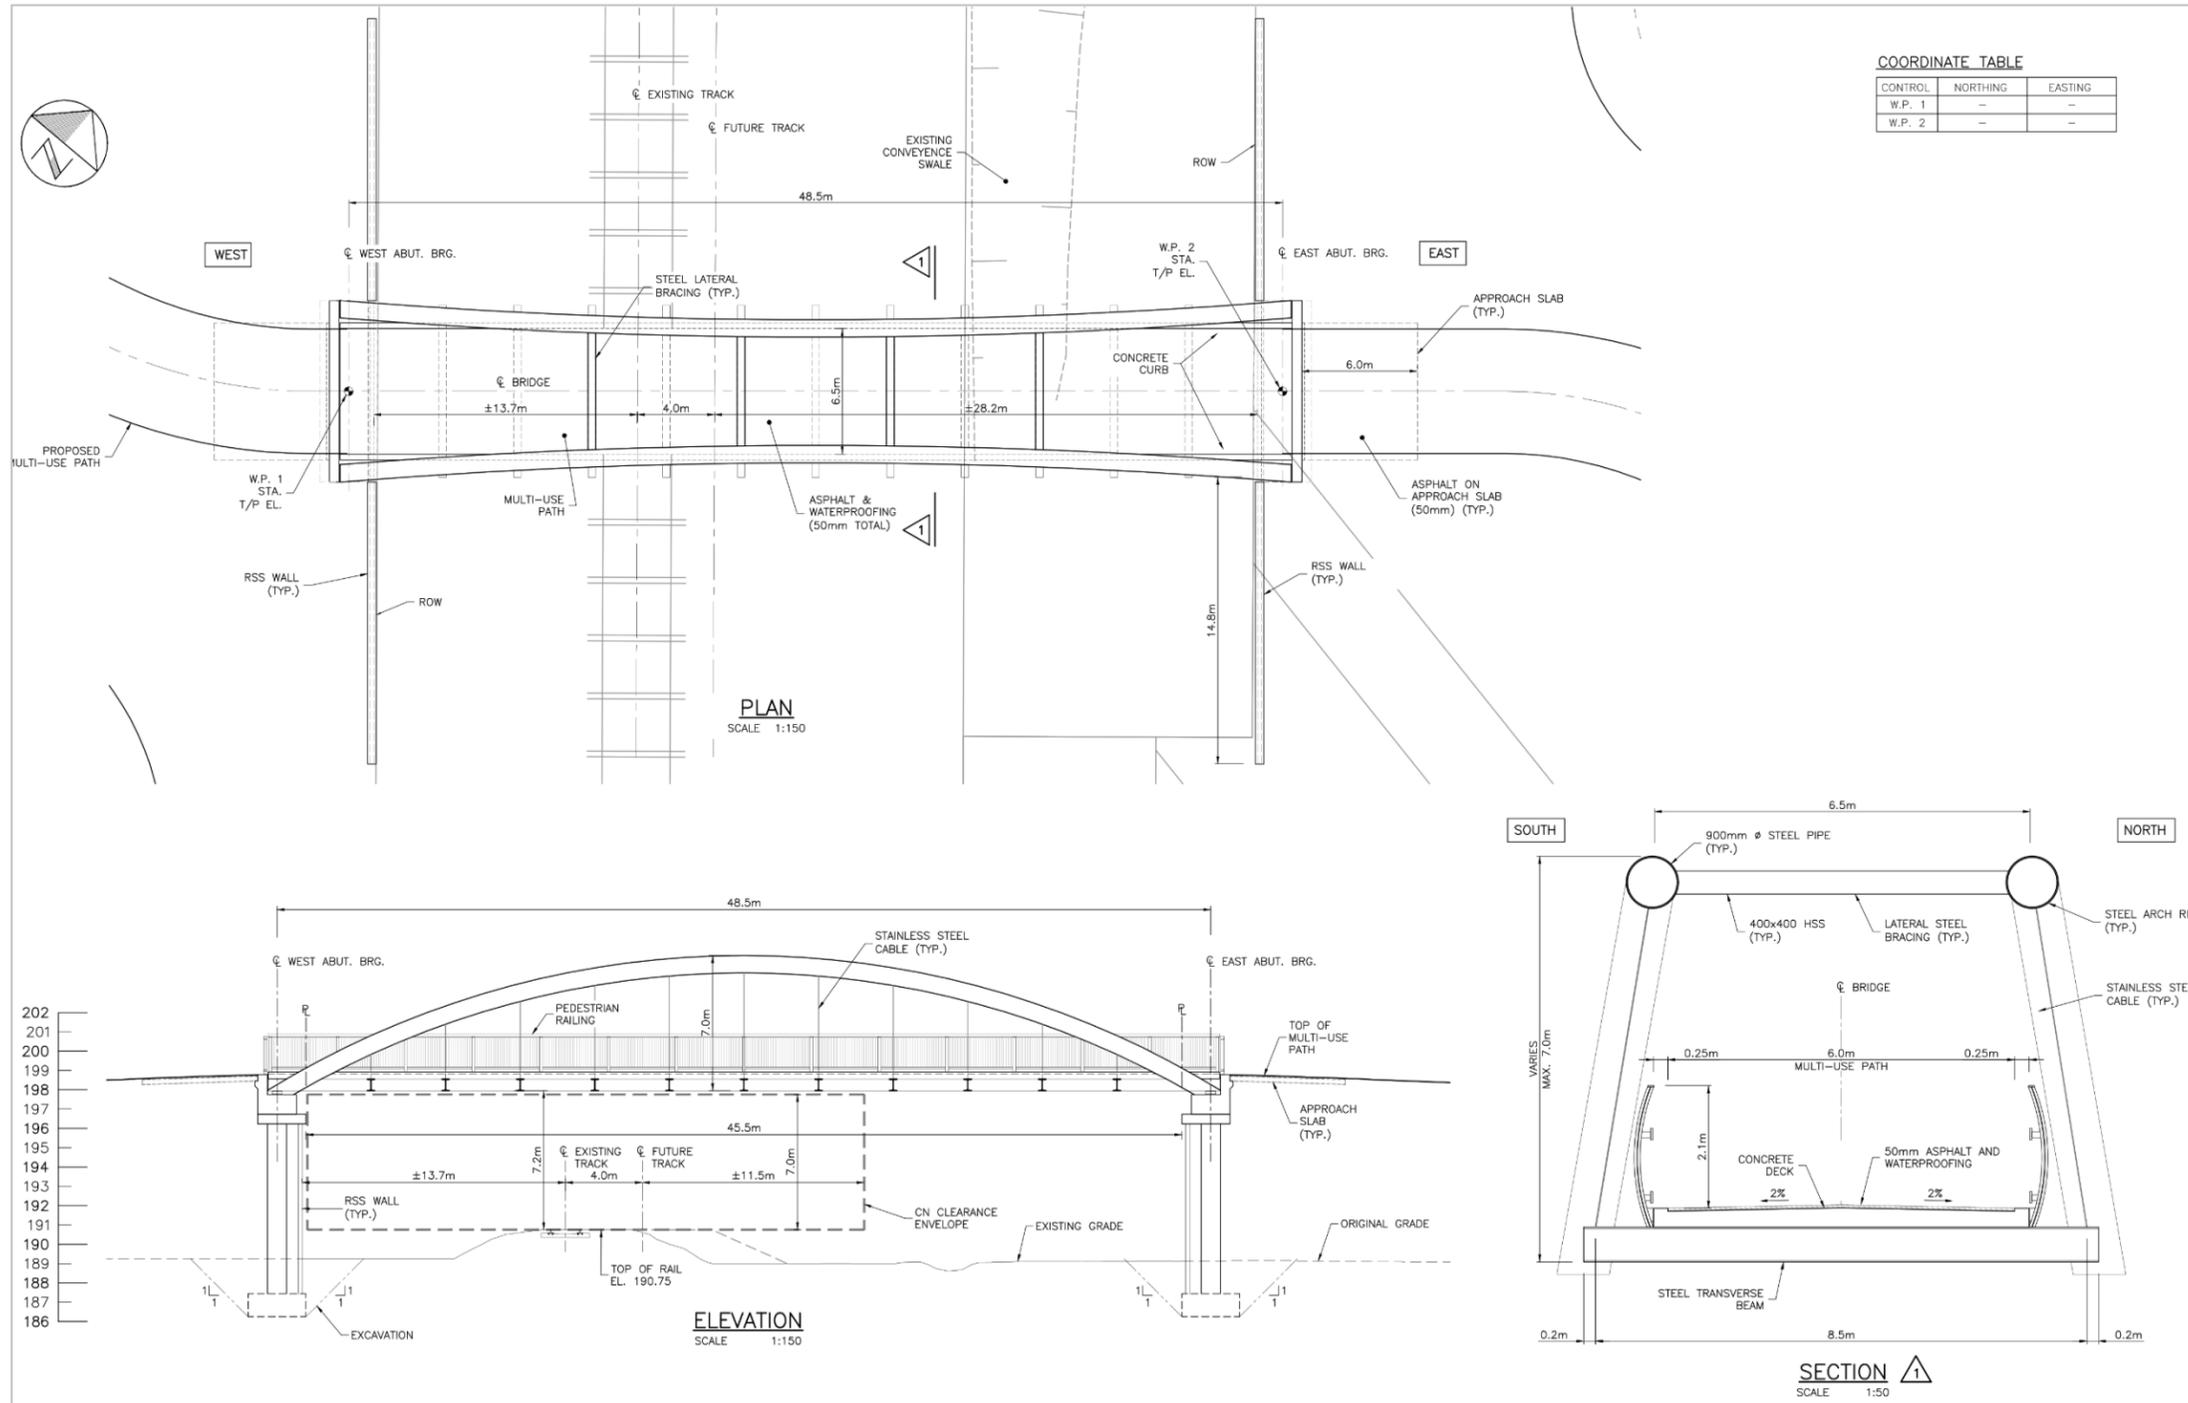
Alternative D1: Full Height Arch Bridge with Hanger Cables with Alternative Option 1
